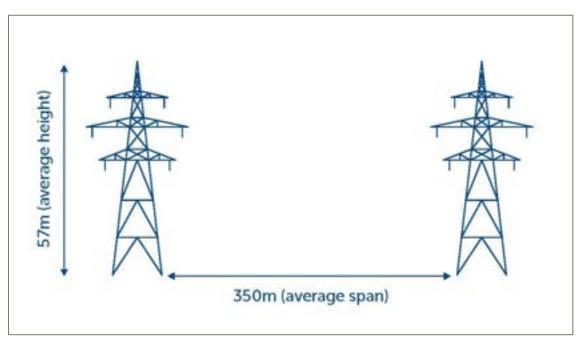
Typical SSE400 steel lattice tower design (Schematic)
